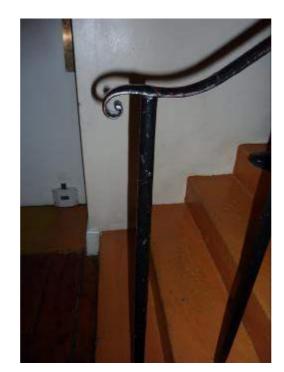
No. 79- the basement stair still retains its original wrought iron hand rail
